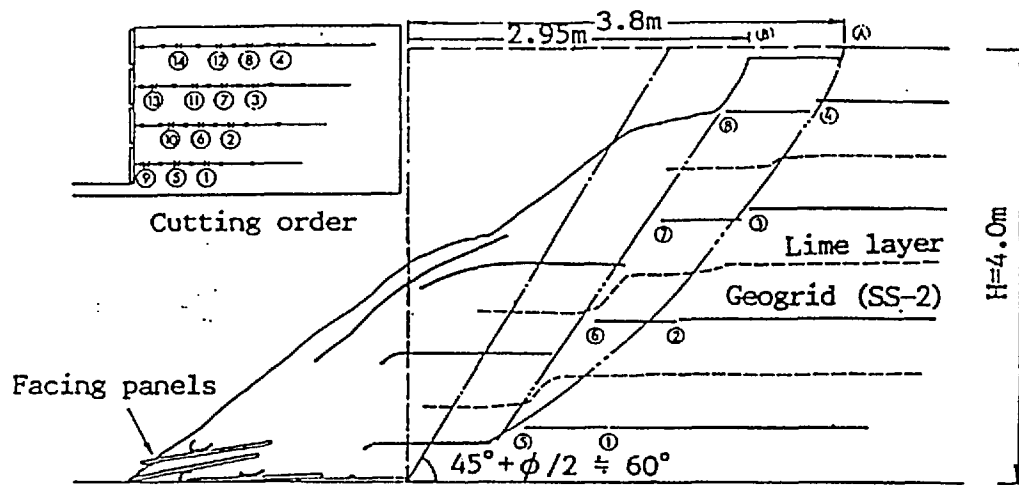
Geometry of reinforced wall and locations of observed failure plane (after Minami *et al.* 1987)
